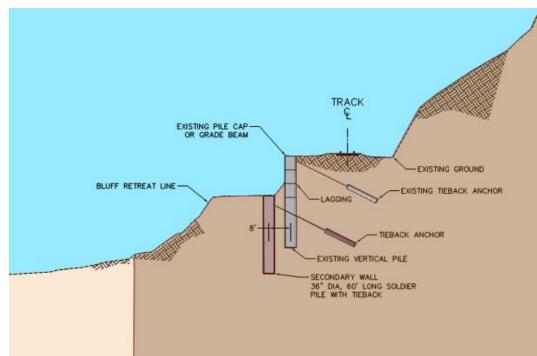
Typical Section of Secondary Wall - Trackbed Support Retrofit Areas
